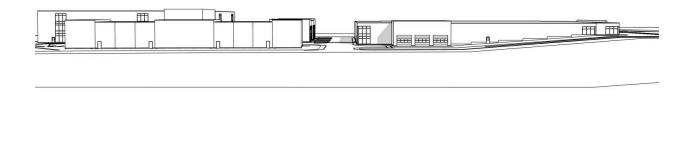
Building Massing - Massing of all buildings south elevation down Dairy Drive. Buildings
